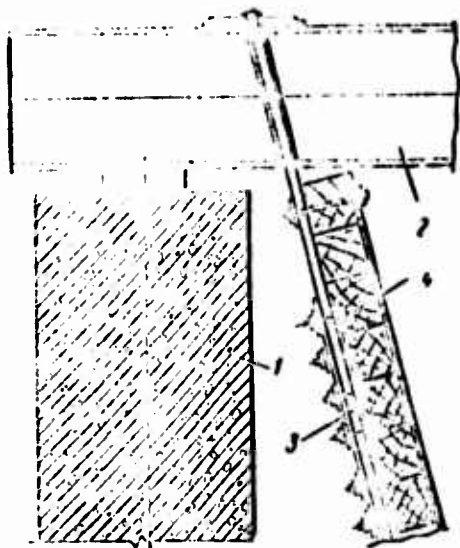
A part of the support of designs of the capacitive part on longitudinal ferroconcrete beams of the hopper: 1 - main beam; 2 - double channel uprights, No. 30a, set at a spacing of 1750 mm; 3 - suspension of 220 × 18 mm; 4 - lining.
